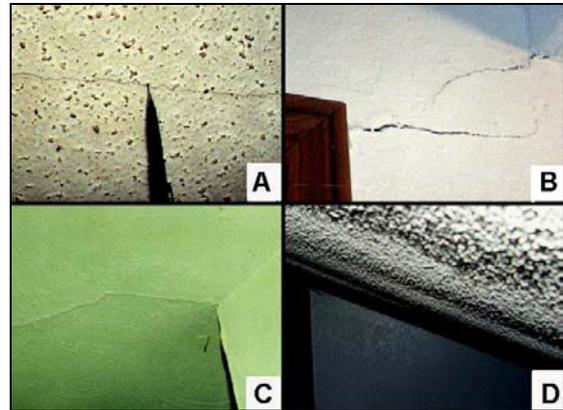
Wall distress not caused by wind: A) hairline crack contains dirt, B) paint bridges cracks, C) cracks patched and painted, and D) wavy appearance to gypsum board ceiling.
